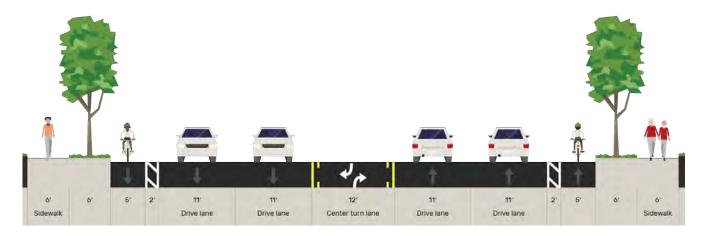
EXISTING MINOR ARTERIAL STREET CROSS-SECTION (SOURCE: STREETMIX)
